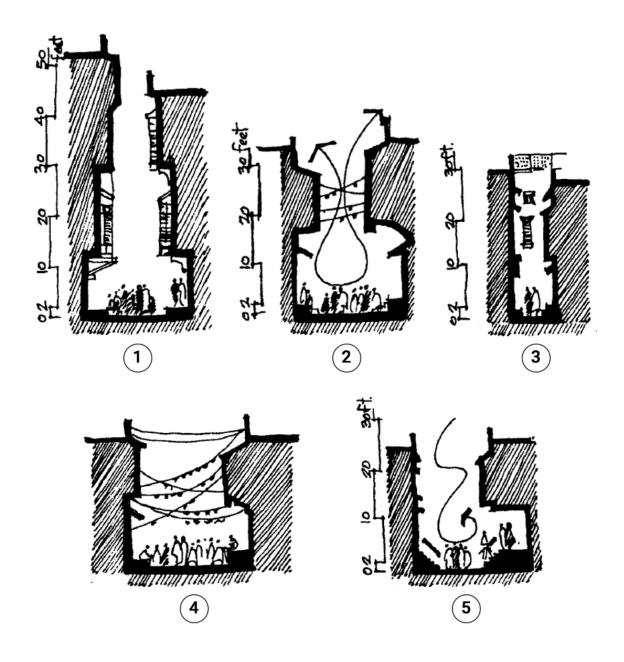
Cross sections of streets of Walled City of Lahore showing various profiles that exist in the historic center. The sections show how the buildings on both sides of the street keep it shaded, cool and ventilated. The proximity of the buildings allows for the balconies on upper levels to be used as socializing space. These (Source: Ellahi M. Ishteeaque, from "Contemporary House Design: A Lesson from Lahori Traditional Architecture)
